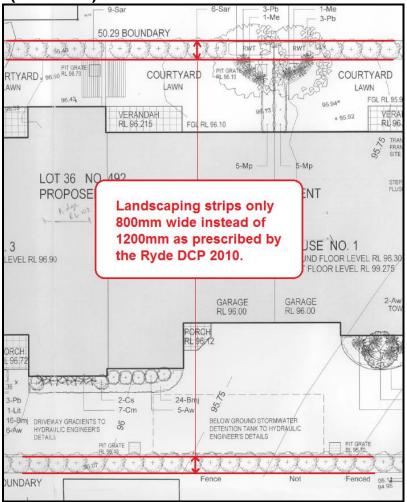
Landscape Plan extract showing the landscaping strips along the side boundaries to be only 800mm wide. The Ryde DCP 2014 requires such landscape strips to be 1,200mm wide to enable landscape planting that will assist in the provision of visual privacy to adjoining development.
